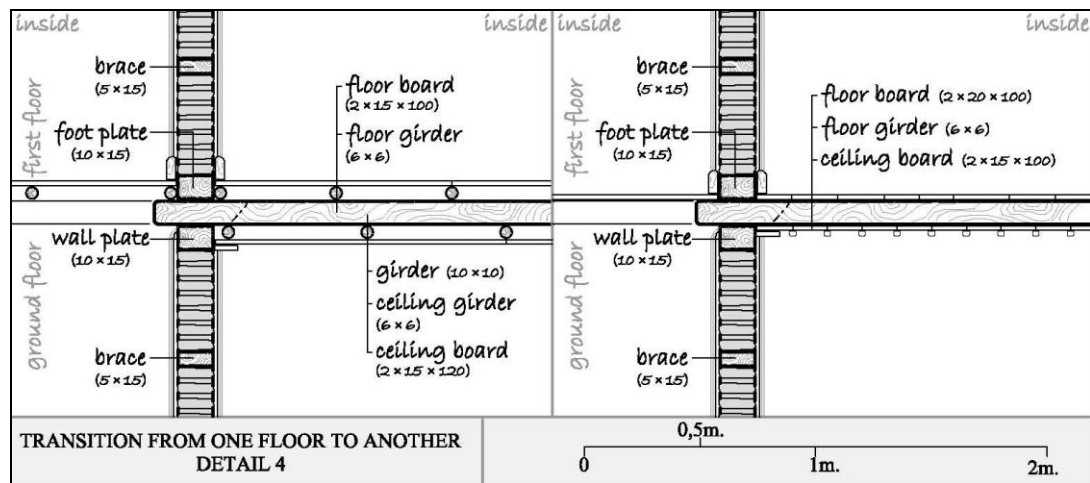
, Detail of use of timber frame walls in both floors; use of girder, floor girders and ceiling girders together at floor change (left), use of only floor girders at floor change (right)
